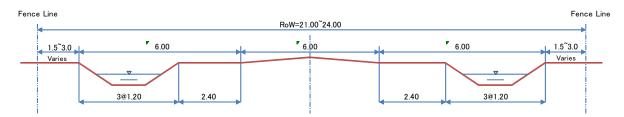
Standard Cross Section Type-I (Local Roads)
